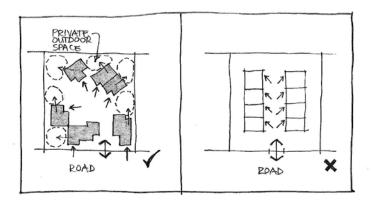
Carefully considered layout of buildings on sites helps to contribute to a more pleasant living environment.
